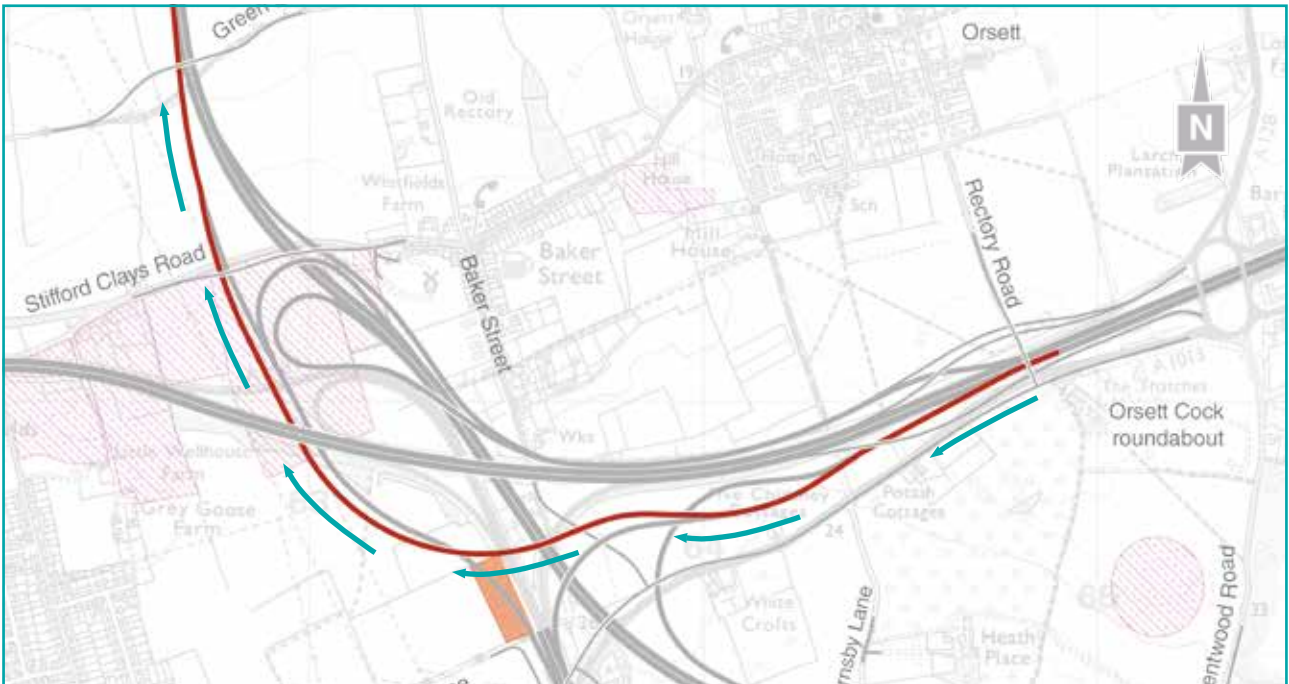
A13 westbound to LTC northbound. Leave the A13 westbound and follow the road, travelling over the connection between the A13 westbound and LTC southbound. Continue on the road to the west side of the A1089 and merge with the road connecting the A1089 northbound to the LTC northbound. Join the LTC northbound north of Green Lane.
